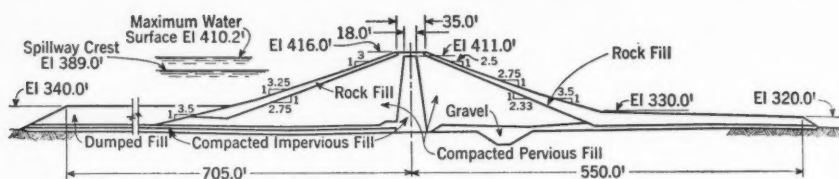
EAST TERRACE, FRANKLIN FALLS EMBANKMENT
